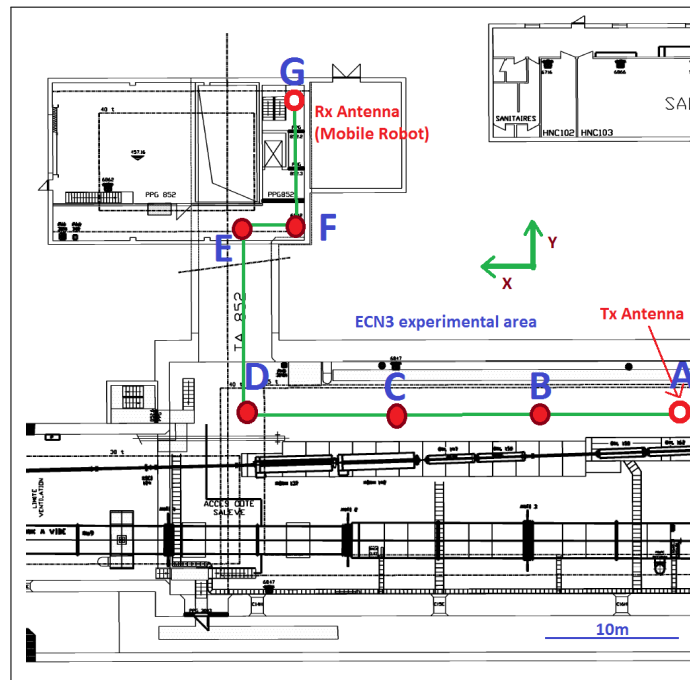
Floor plan of the ECN3 tunnel at CERN.
